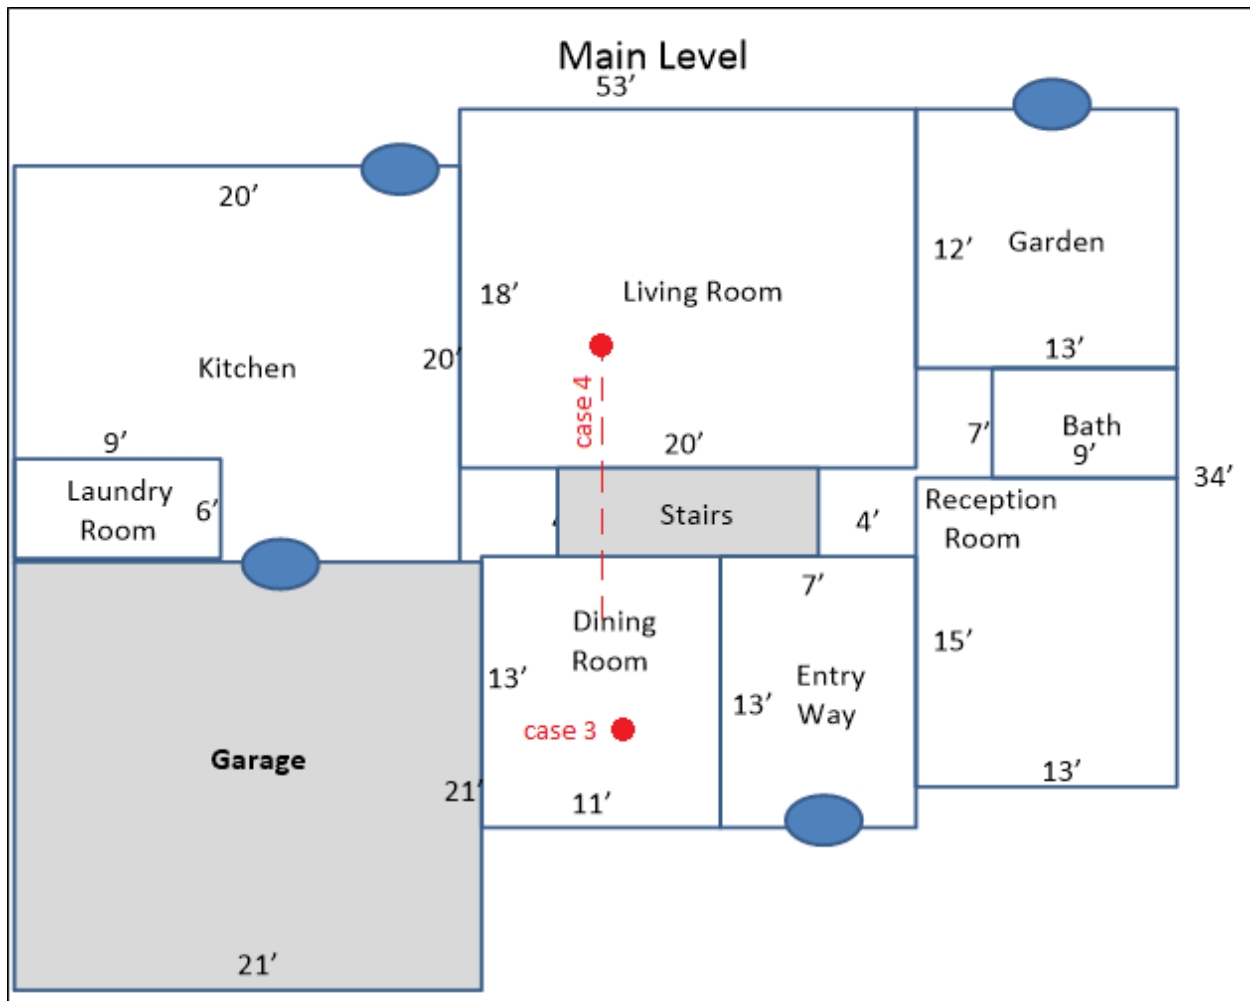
WiFi test house, main/mid level floorplan with test cases
